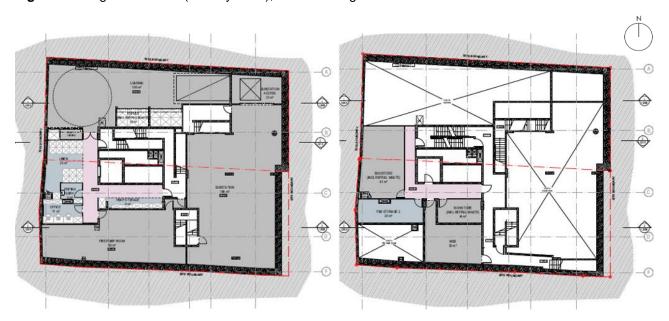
Original Scheme (11 May 2022), Proposed Basement Plan (left) and Basement Mezzanine Plan (right)
